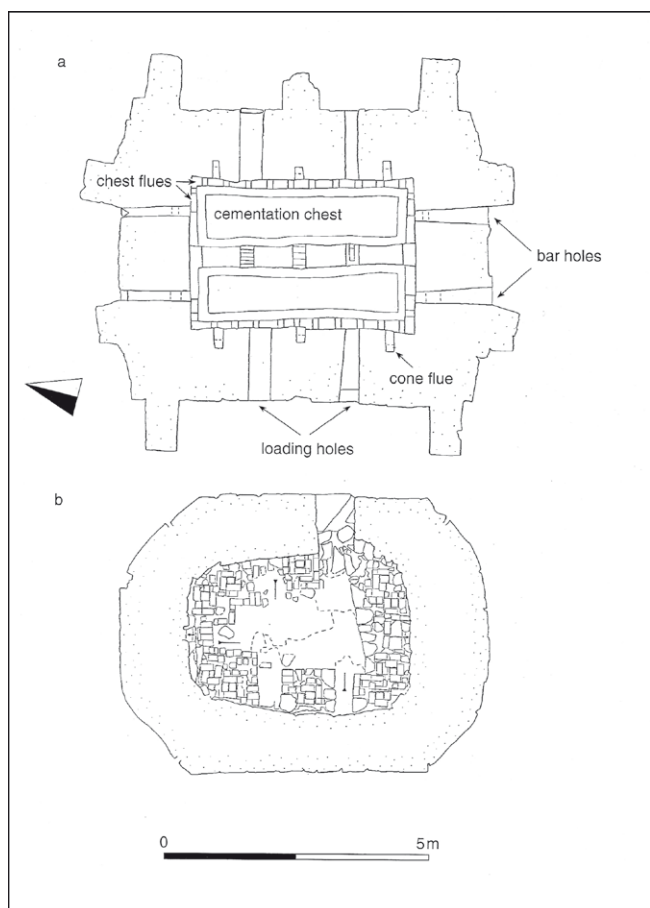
Derwentcote—plans of furnace at: a) chest compartment level; b) cone floor level.
